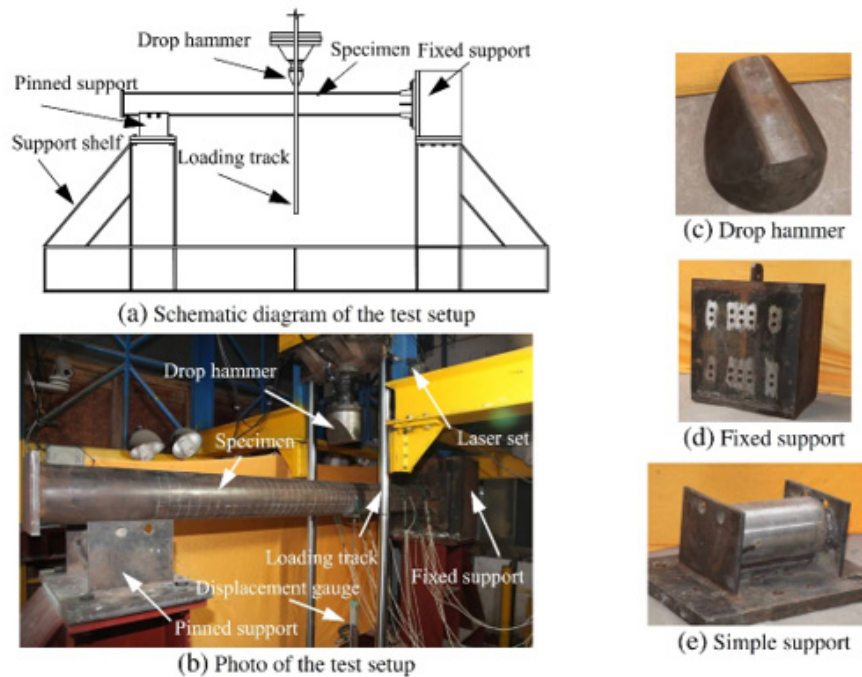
Impact load experimental testing setup by Han et al. [158]. Where (a) is Schematic drawing of the test setup, (b) experimental impact testing setup, (c) drop hammer, (d) fixed support and (e) simply supported.
